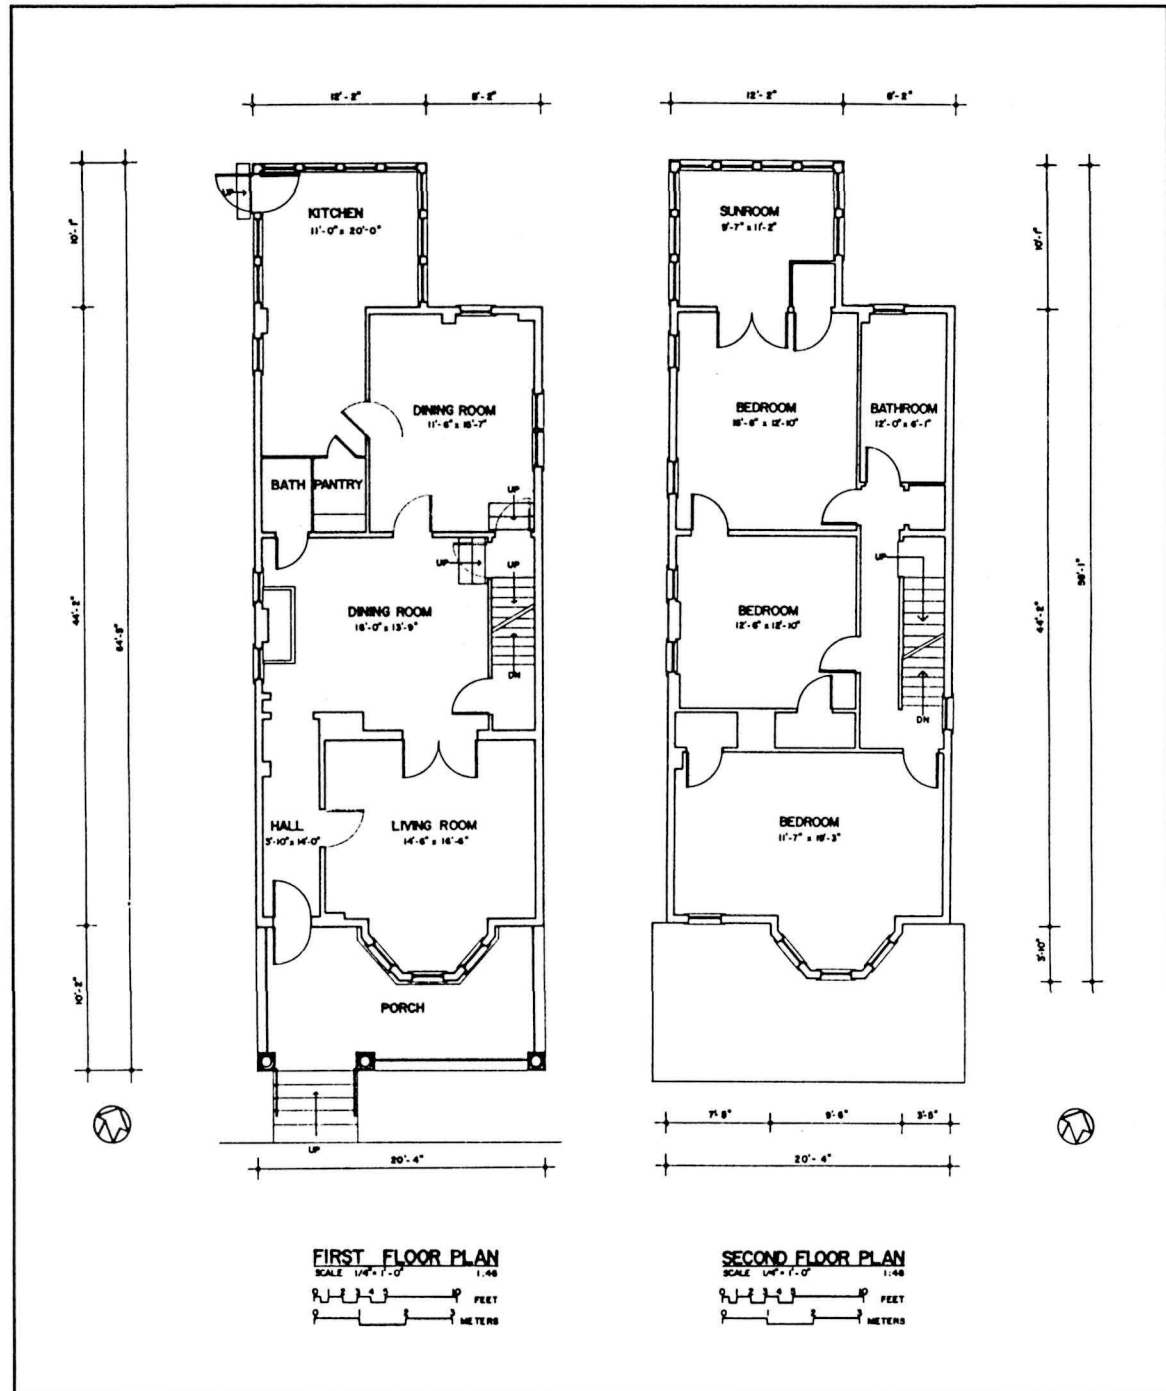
William and Amanda Kantner House, 808 Lexington Ave., first and second floor plans, drawn by Pat Reese, June 1989.
